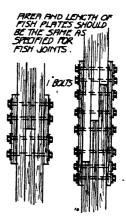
RAKERS BUILT UP WITH TWO OR THREE PLANKS Joints may be formed as shown by this drawing.
